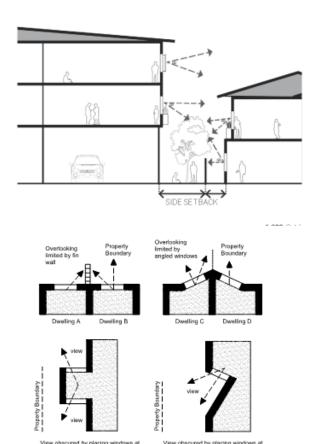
8 —privacy between dwelling units.
